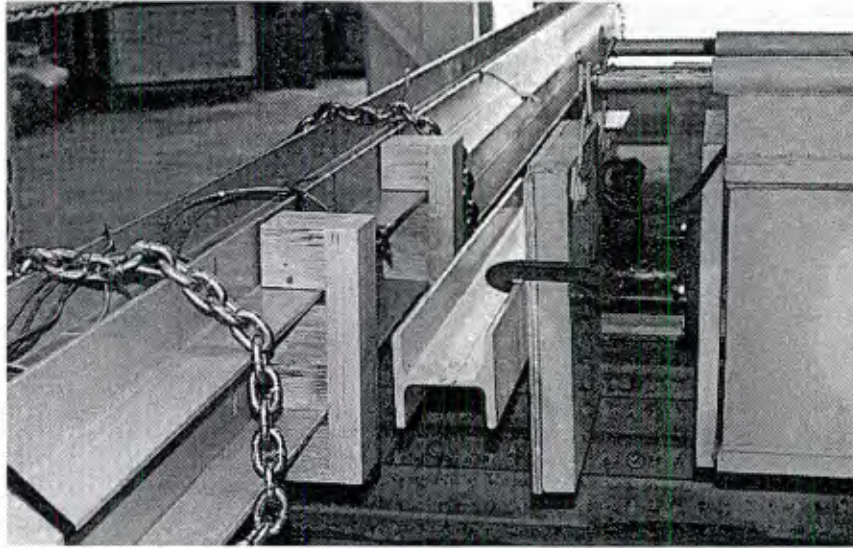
Spreader beam and oak saddles at load point on grid section pile specimen.
